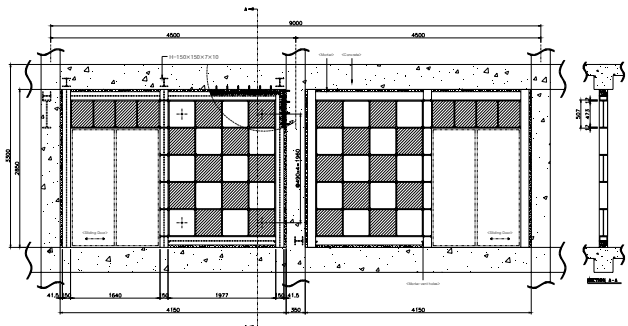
Elevation and Section of Steel Grid Shear Wall
